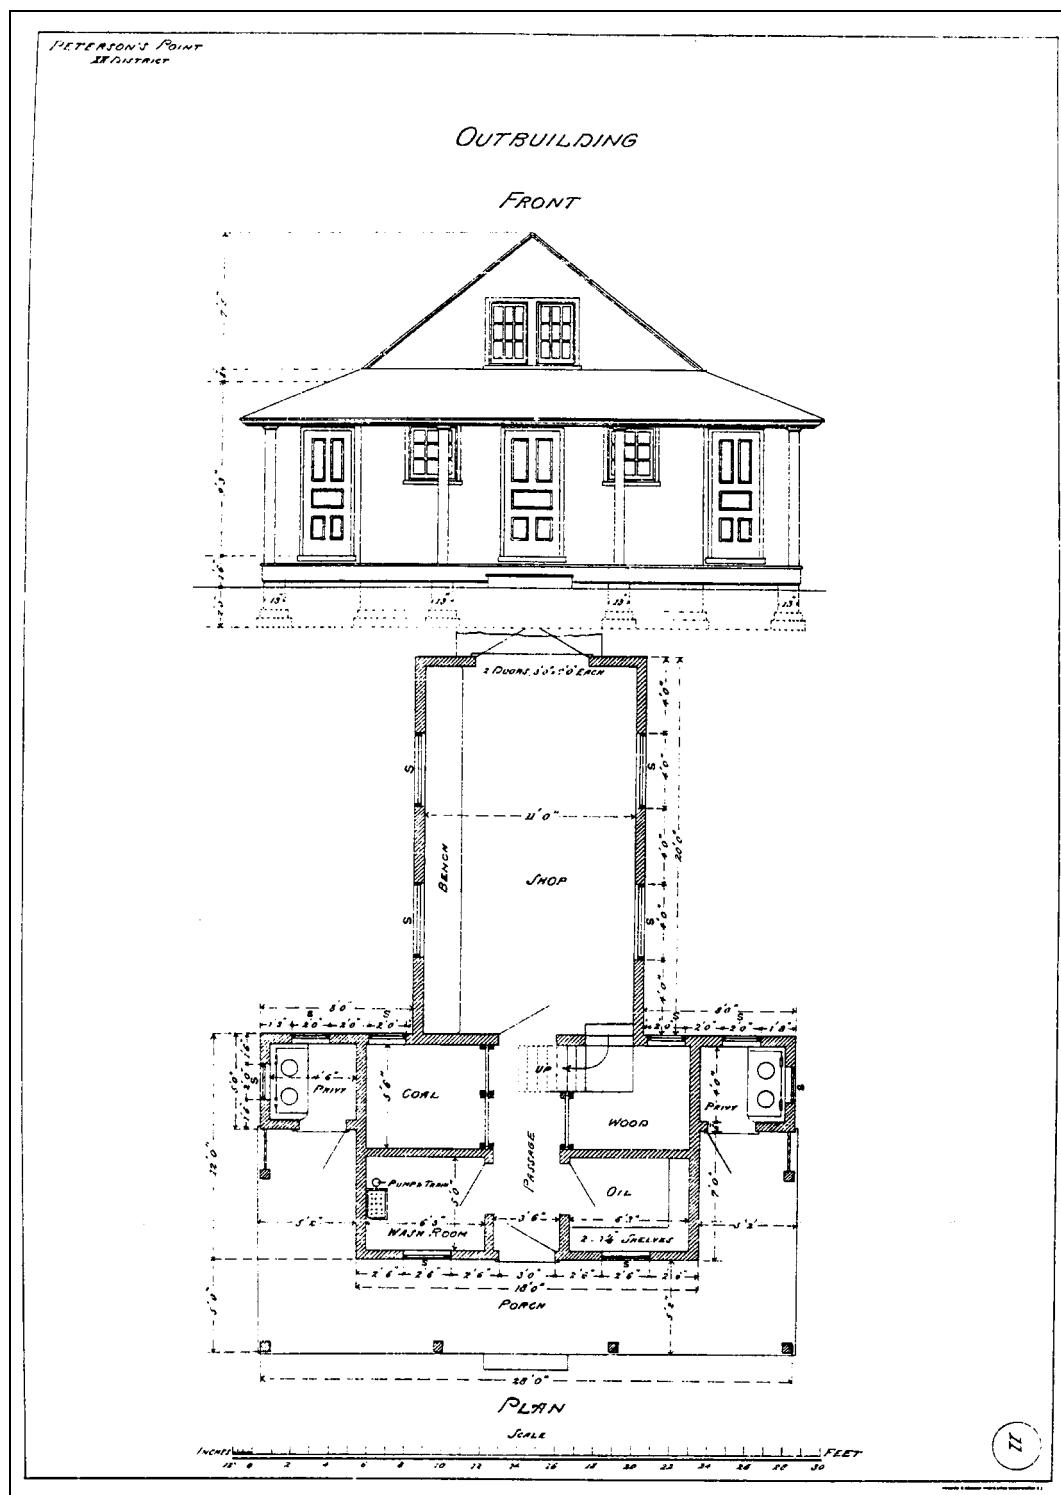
Floor Plan and Elevation, Shop Building, Tillamook Bay Life-Saving Station. Source: Nautical Research Centre (#429).
